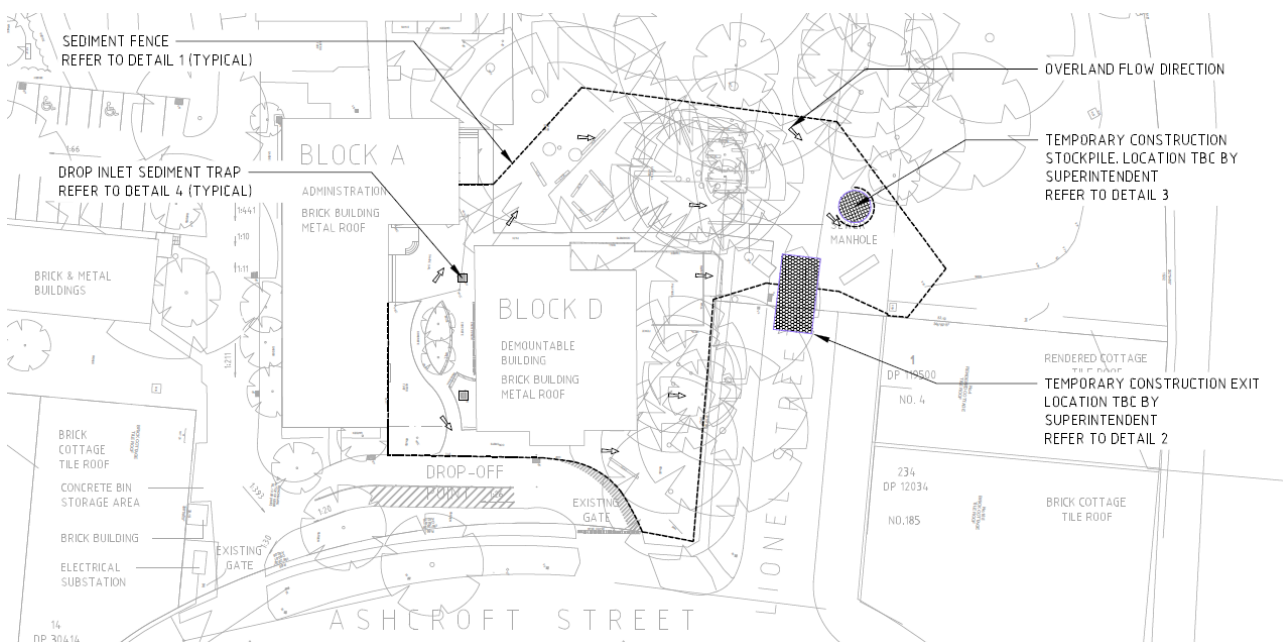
Sediment & Erosion Control Plan (Source: Andrew Yaldas Consulting Engineers)
